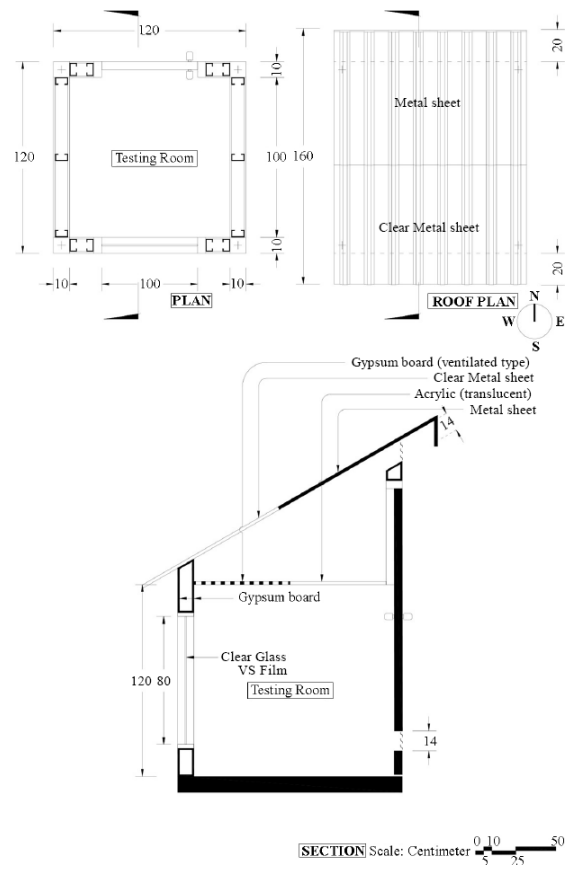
Show Model 2 house model, Tinted Glass with Gypsum Wall (TGGW) tested together with Metal Sheet Roof with Perforated Ceiling (MSRPC)
